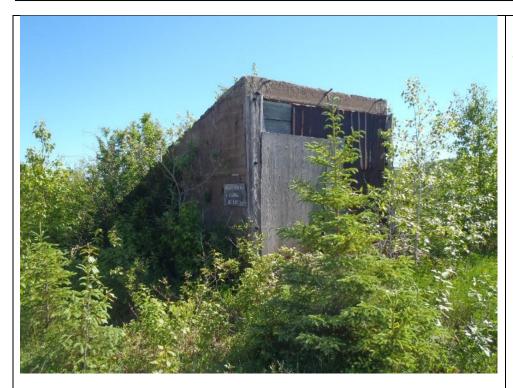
Entrance to Josephine Tunnel. Facing northeast.
